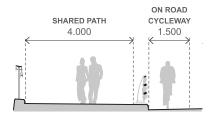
Active transport arrangement Option 2 - shared path plus on road cycleway.
